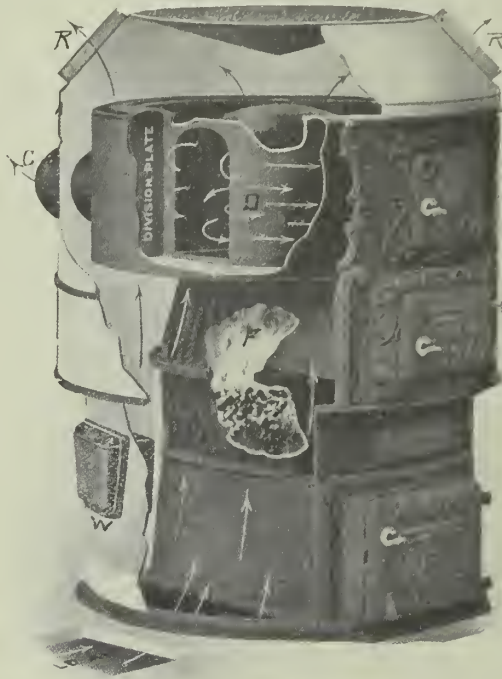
Hot-air furnace showing the internal construction and the method of admission and discharge of the air used in heating the house.
